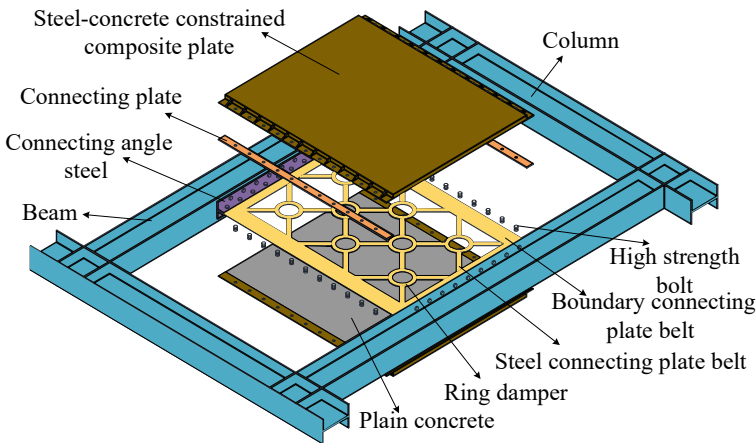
Prefabricated steel plate shear wall with high dissipation
